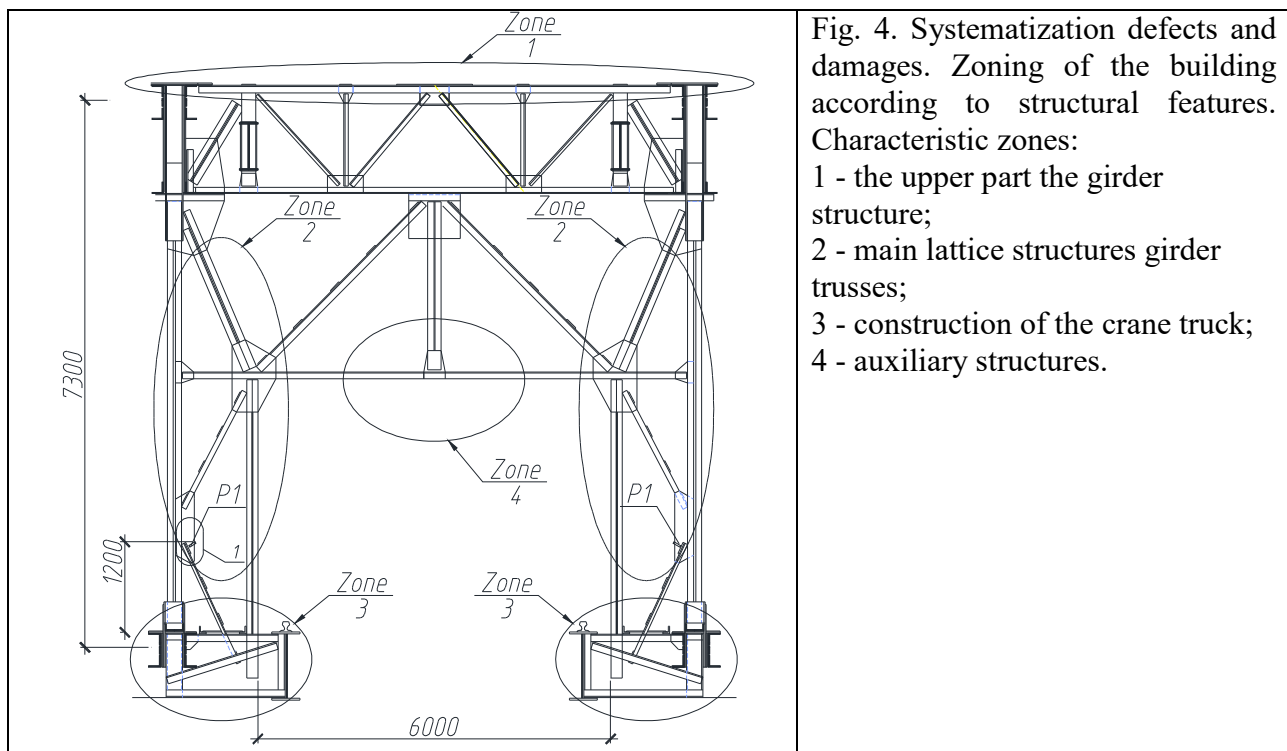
Systematization defects and damages. Zoning of the building according to structural features. Characteristic zones:
